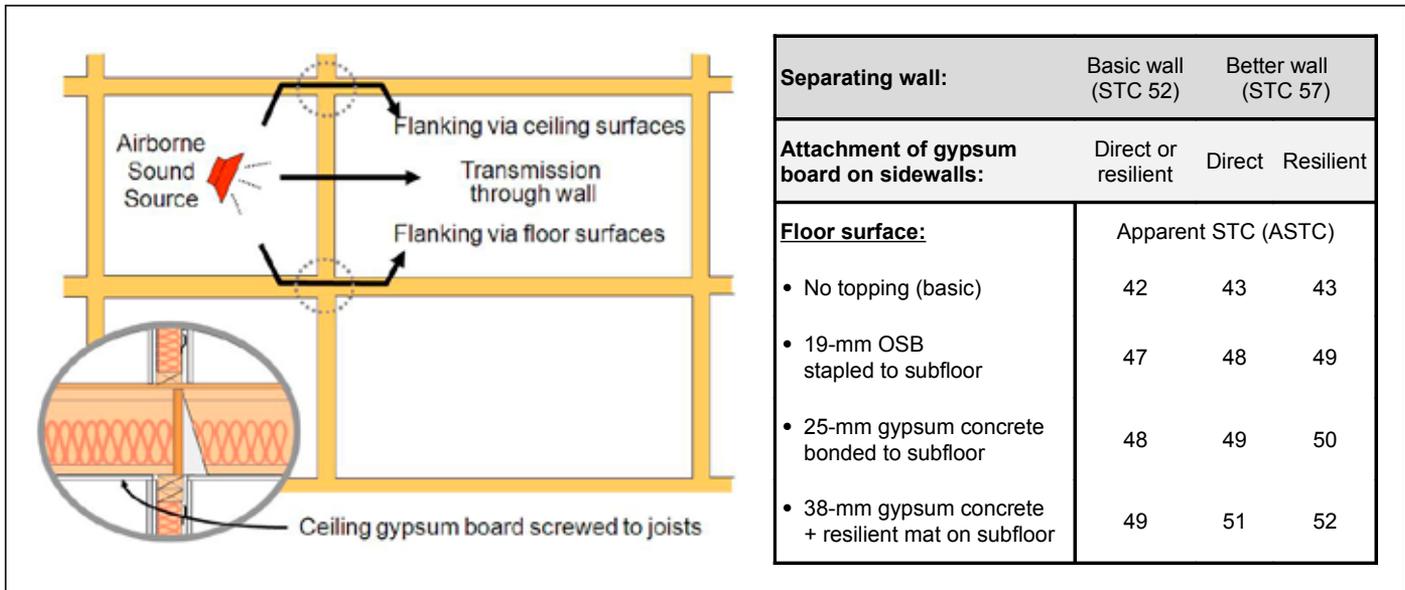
and Table 2: Typical sound transmission paths between side-by-side units in multi-level row housing where gypsum board ceilings are fastened directly to the joists. The sidewalls abutting the separating wall also transmit sound. The table presents the ASTC for the specific separating wall and floor constructions illustrated in Figure 12, with various treatments of the floor and wall surfaces.
